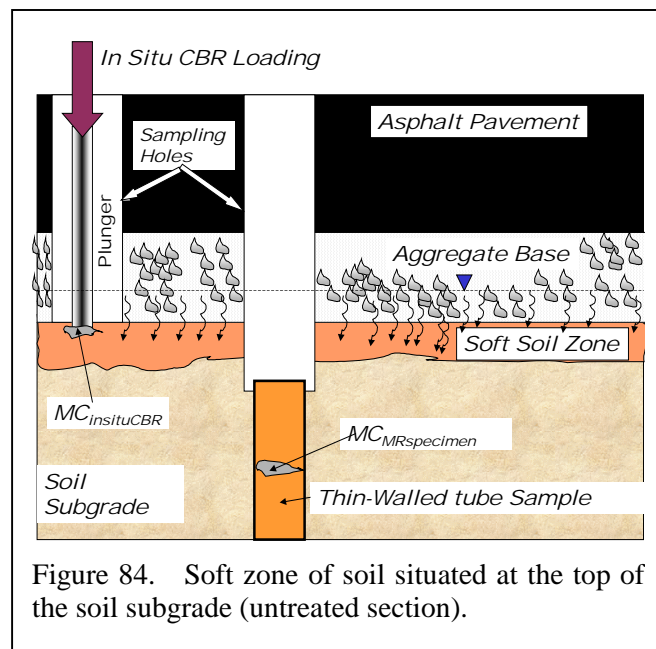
Soft zone of soil situated at the top of the soil subgrade (untreated section).
